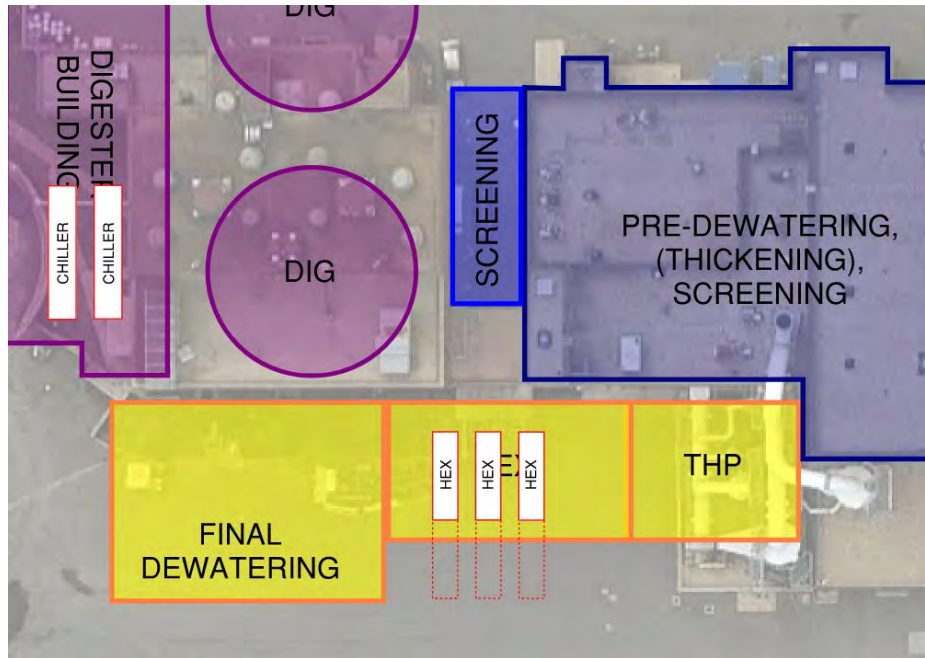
Air-Cooled Chiller: Equipment Plan View—Renovate Dewatering Building Option
